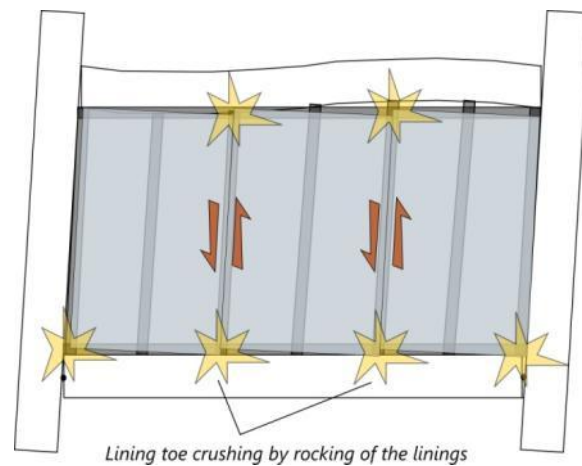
Damage progress and the total damage map at the end of the test for as built steel framed drywall specimen observed in the front face of the specimen FIF1-STFD
